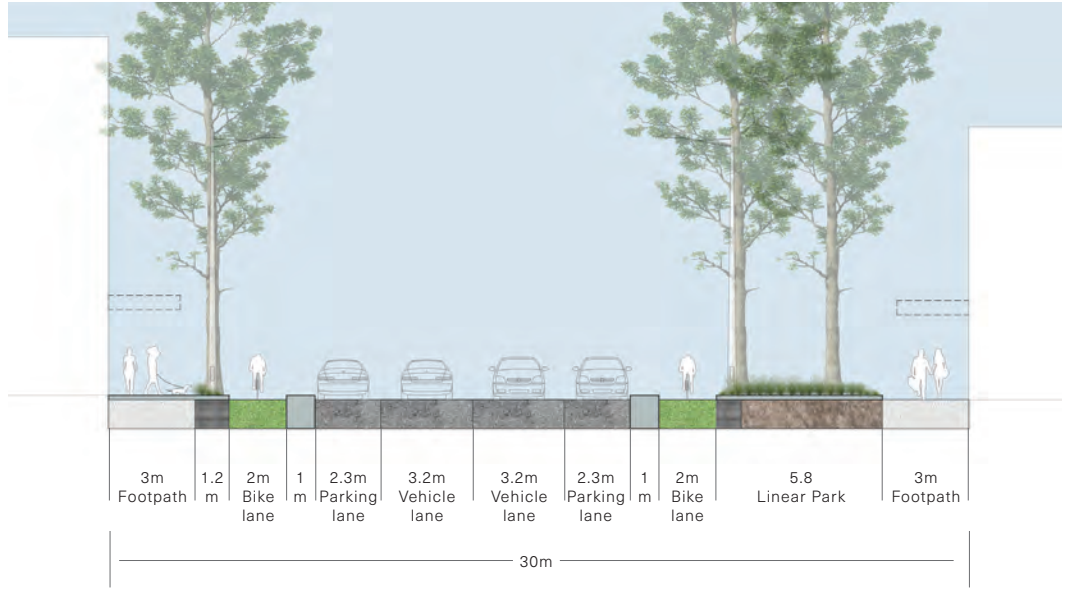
Gheringhap Street block 2 section A-A' showing the proposed condition
